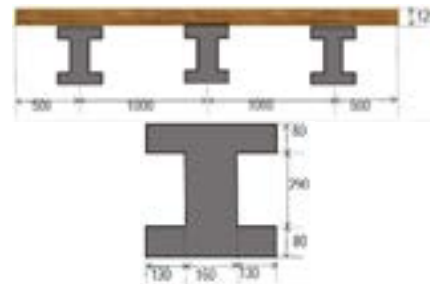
Design Short 2 – bridge cross-section and beam dimensions
